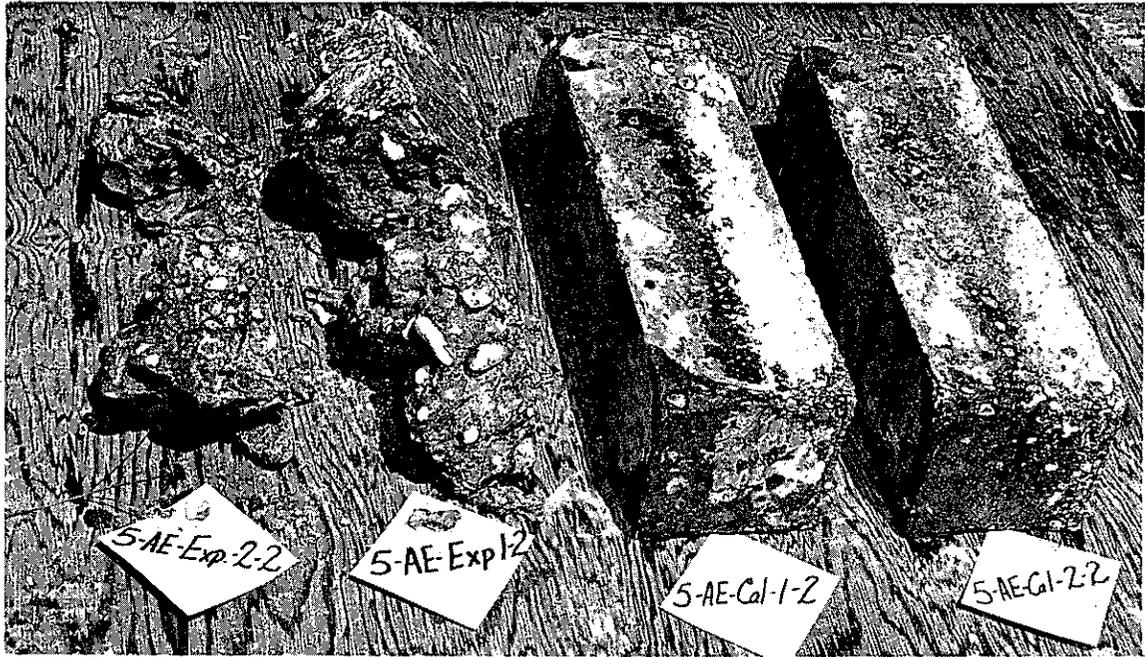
5-sack, air-entrained concrete at 30 months sulfate exposure. Shrinkage compensated cement left; Type II cement right. Shrinkage compensated cement concrete removed from test.
